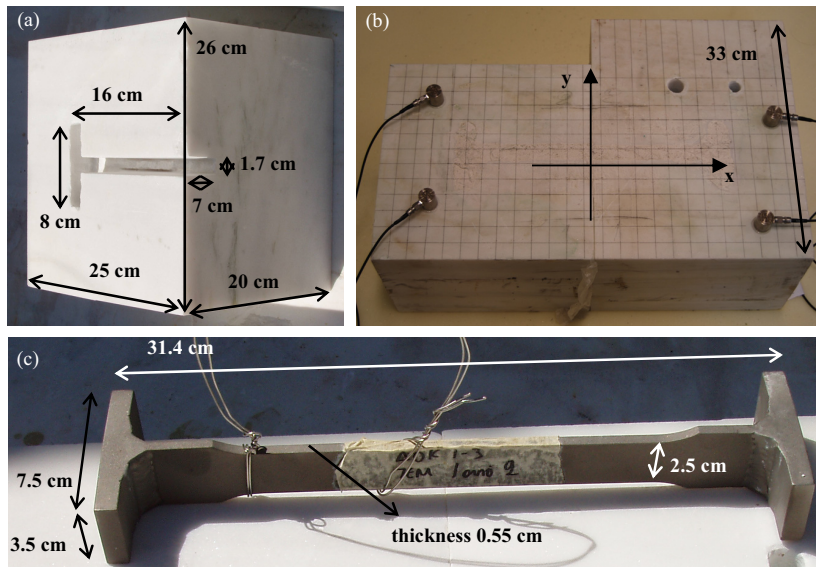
(a) One of the two marble blocks and its dimensions; (b) typical specimen; (c) "I"-shaped connector.
